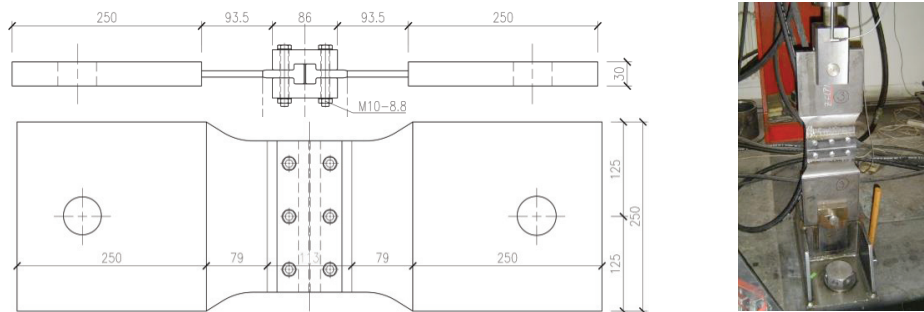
Connection of railway bridge: principle and scheme of connection, shape and dimensions of test specimen, test specimen manufactured.
